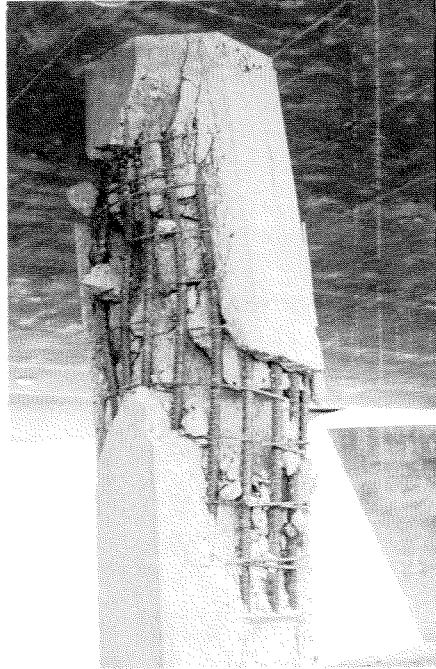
Looking east under the Foothill Boulevard undercrossing, Foothill freeway.
